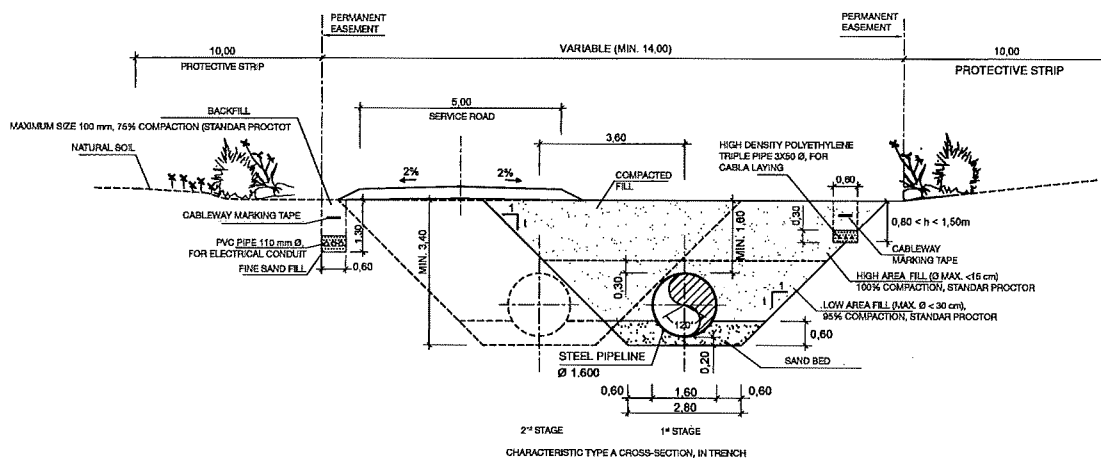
Characteristic cross-section, trench without concrete block (BR 2)
